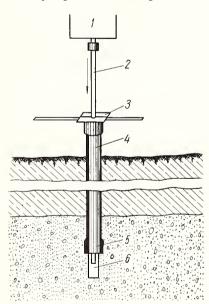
Drilling a hole with a vibrodrilling rig with simultaneous sinking of casing: 1) vibrator, 2) drilling rod, 3) swivel collar, 4) casing pipe, 5) shoe of casing, 6) bit (sonde).
